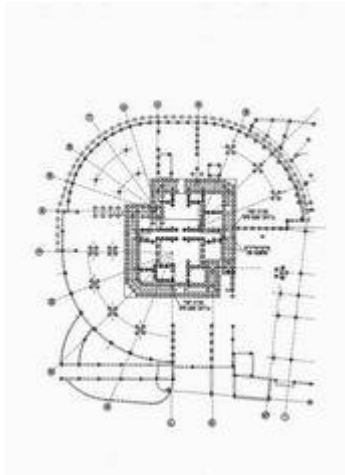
The intersection point of the sloped columns, the rounded edge beam and the new interior column which is added at the 8<sup>th</sup> floor.
